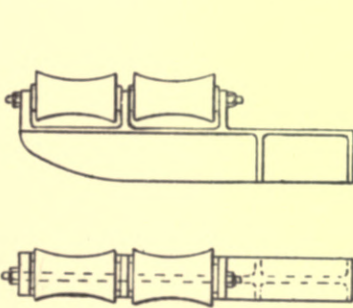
Elevation and Plan of Roller Bracket for Pipes.
